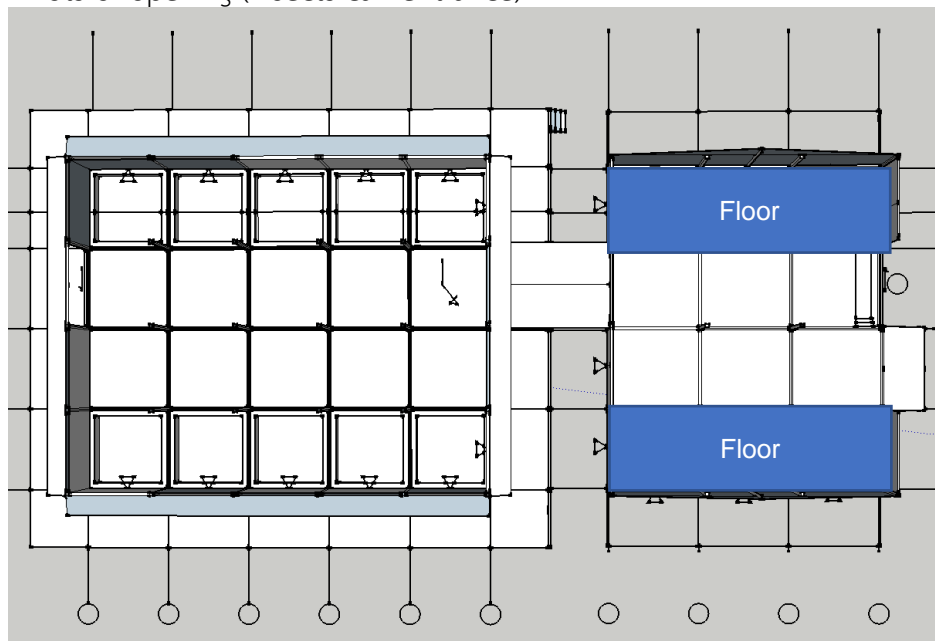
Garbage (unpack secondary packaging) and Secondary packaging storage
